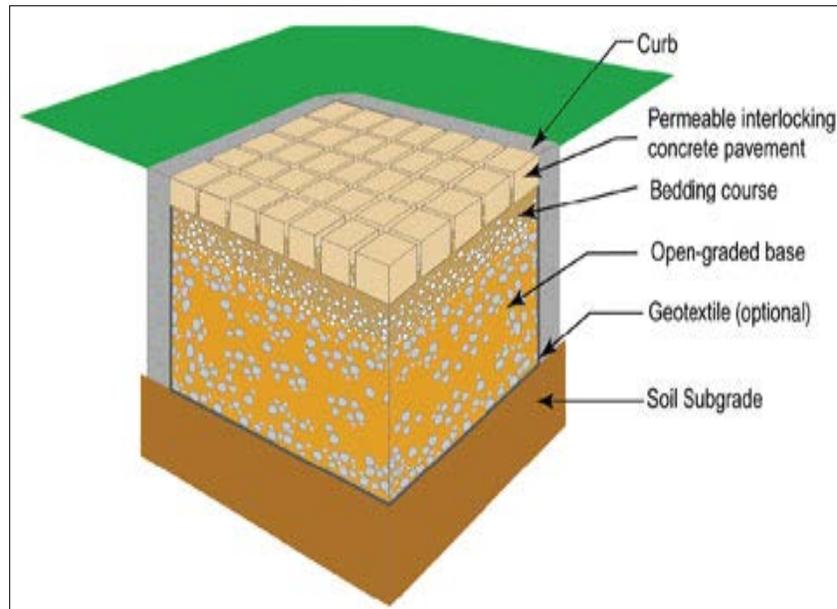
Typical permeable pavement cross section (Interlocking Concrete Pavement Institution).
